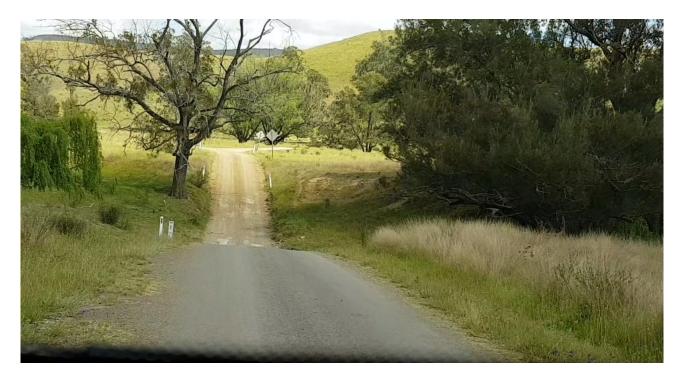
Looking west on Bowmans Creek Road / Albano Road at causeway example
